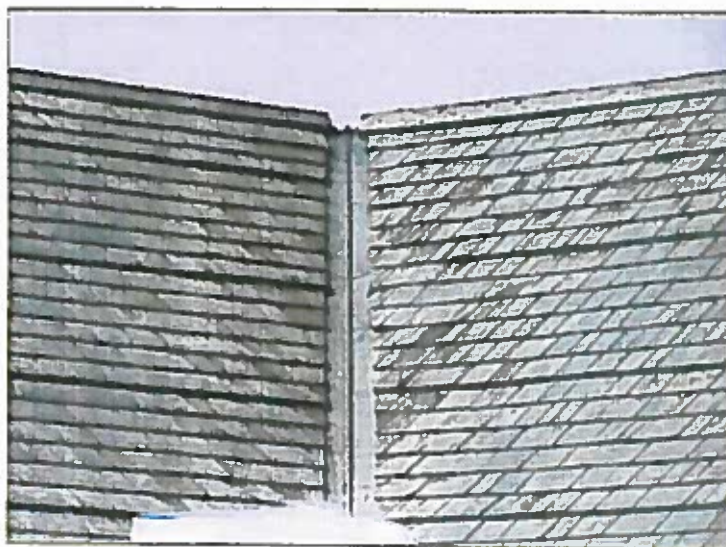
Typical stepped wood shingle roofing, valley lined with sheet metal, and ridges protected with wooden boards.
